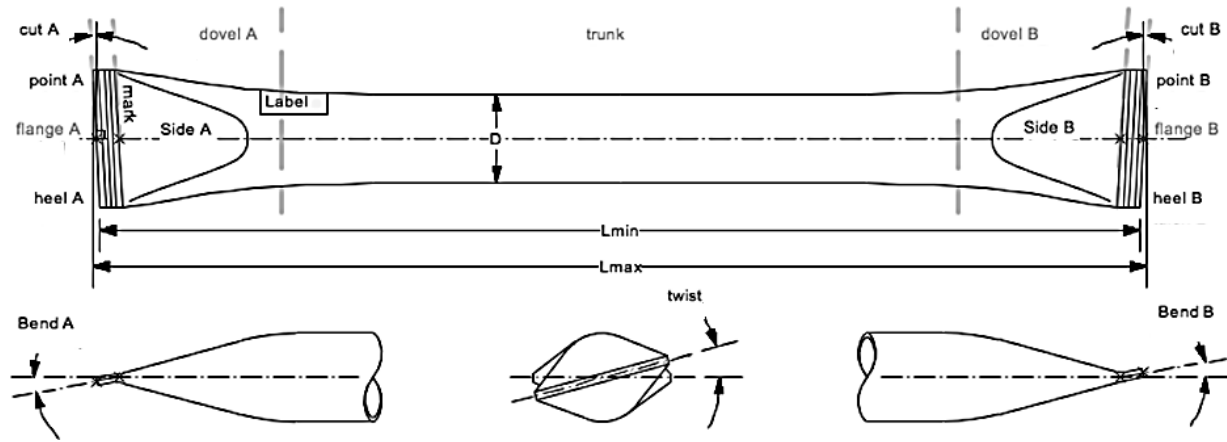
Typical Tubular Member Configuration (Geometrica 2016)
